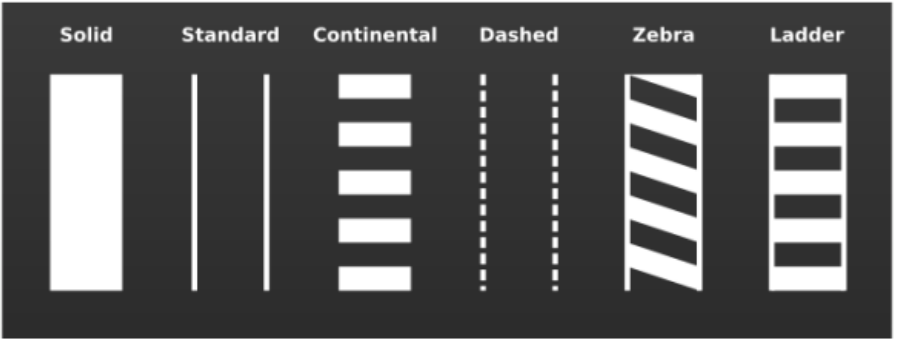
Example of different patterns of crosswalks. Photo courtesy of sbbetterstreets.
